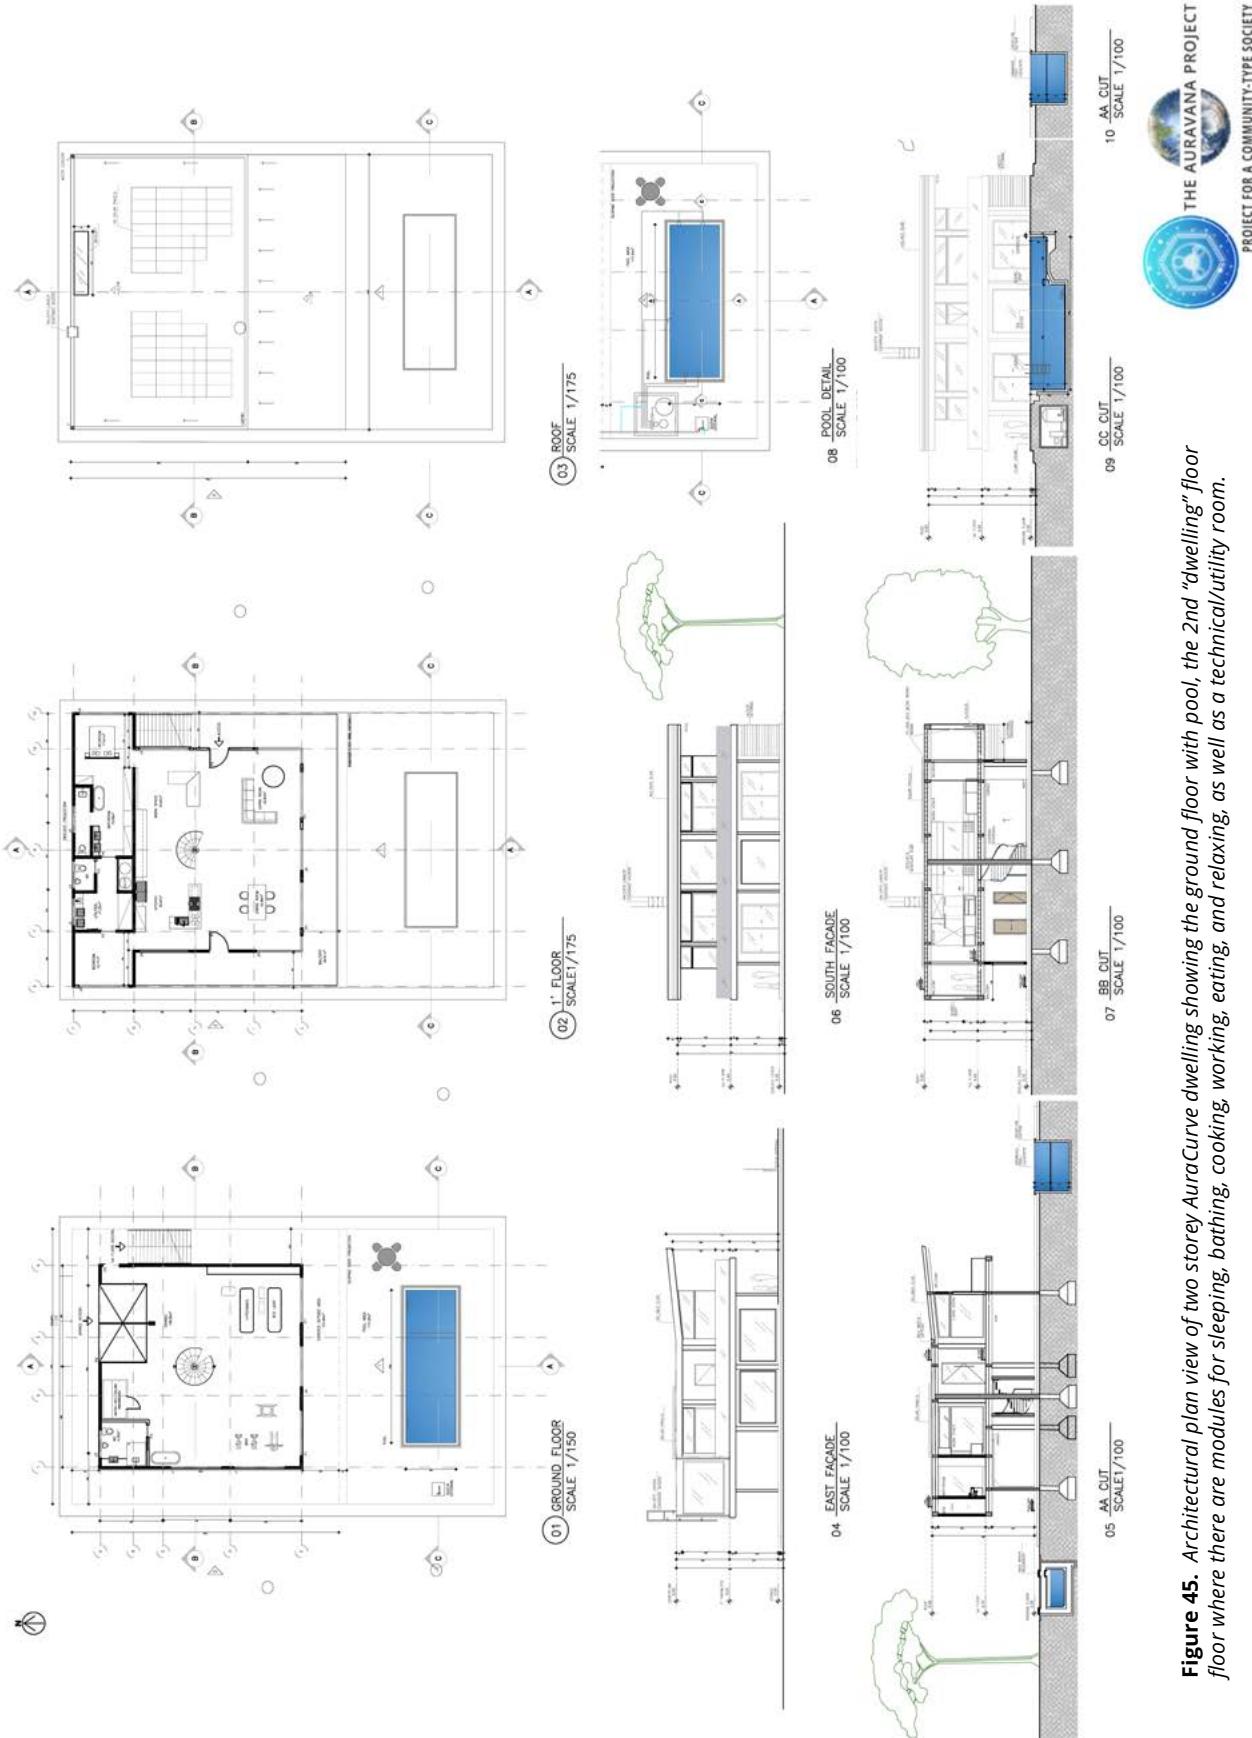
Architectural plan view of two storey *AuraCurve* dwelling showing the ground floor with pool, the 2nd "dwelling" floor floor where there are modules for sleeping, bathing, cooking, working, eating, and relaxing, as well as a technical/utility room.
